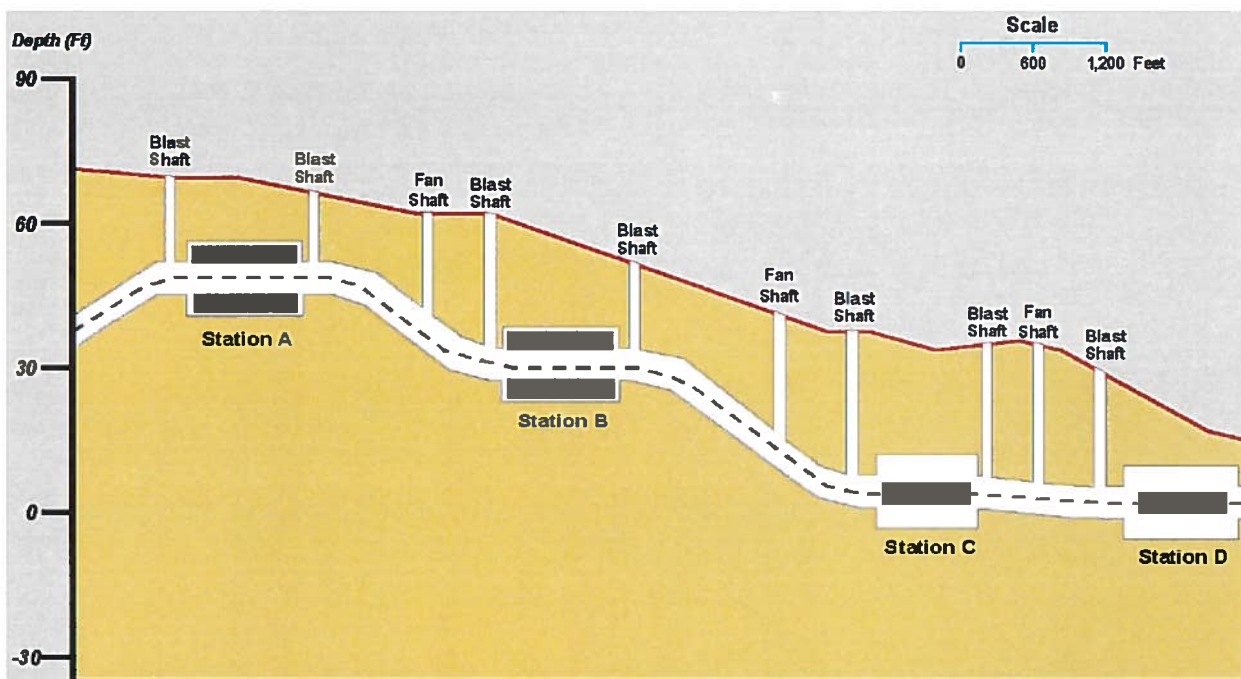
Ventilation Shafts, Tunnel, Stations, and Fans in a Sample Rail Tunnel System
